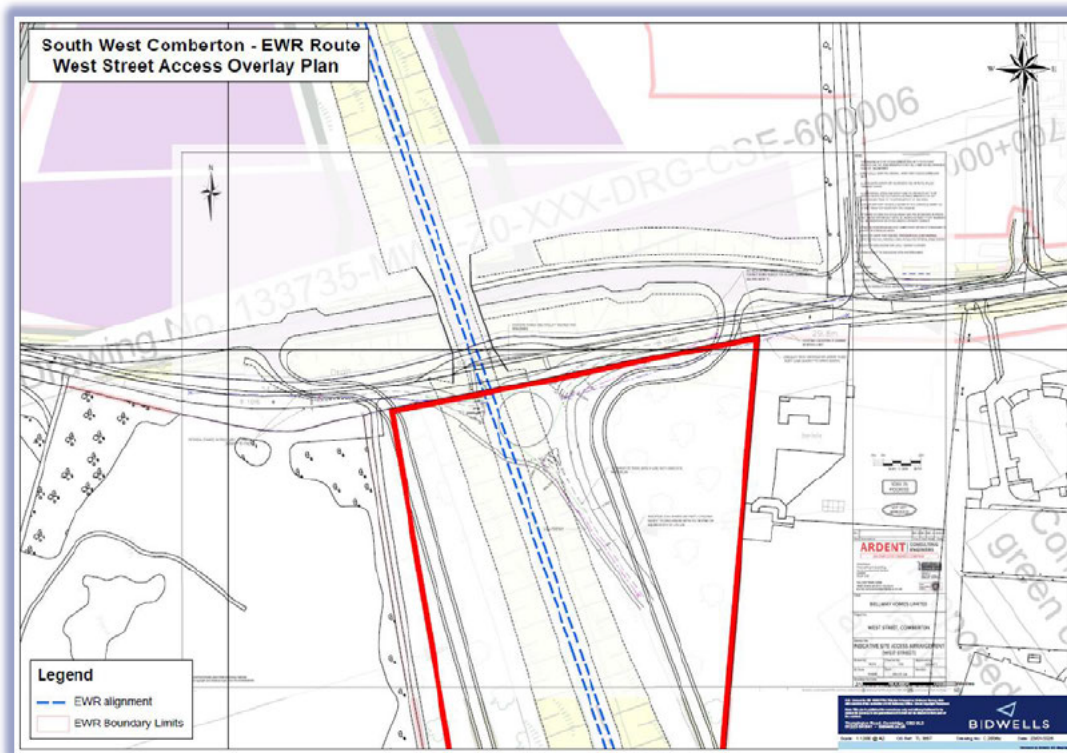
Overlay Plan showing EWR proposals and Clients Site Access
